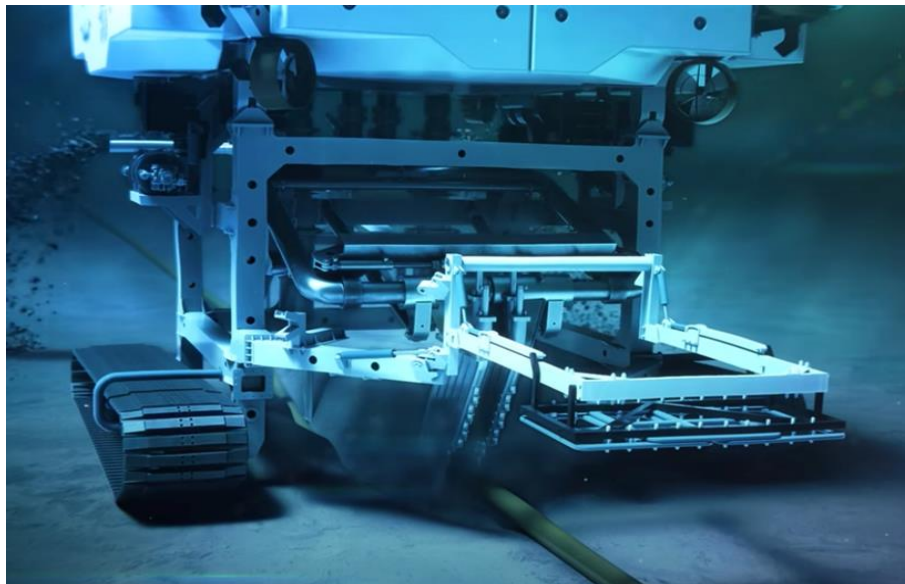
Exemplary jetting equipment [Source: <https://www.youtube.com/watch?v=wb1le4zRA2M>]
